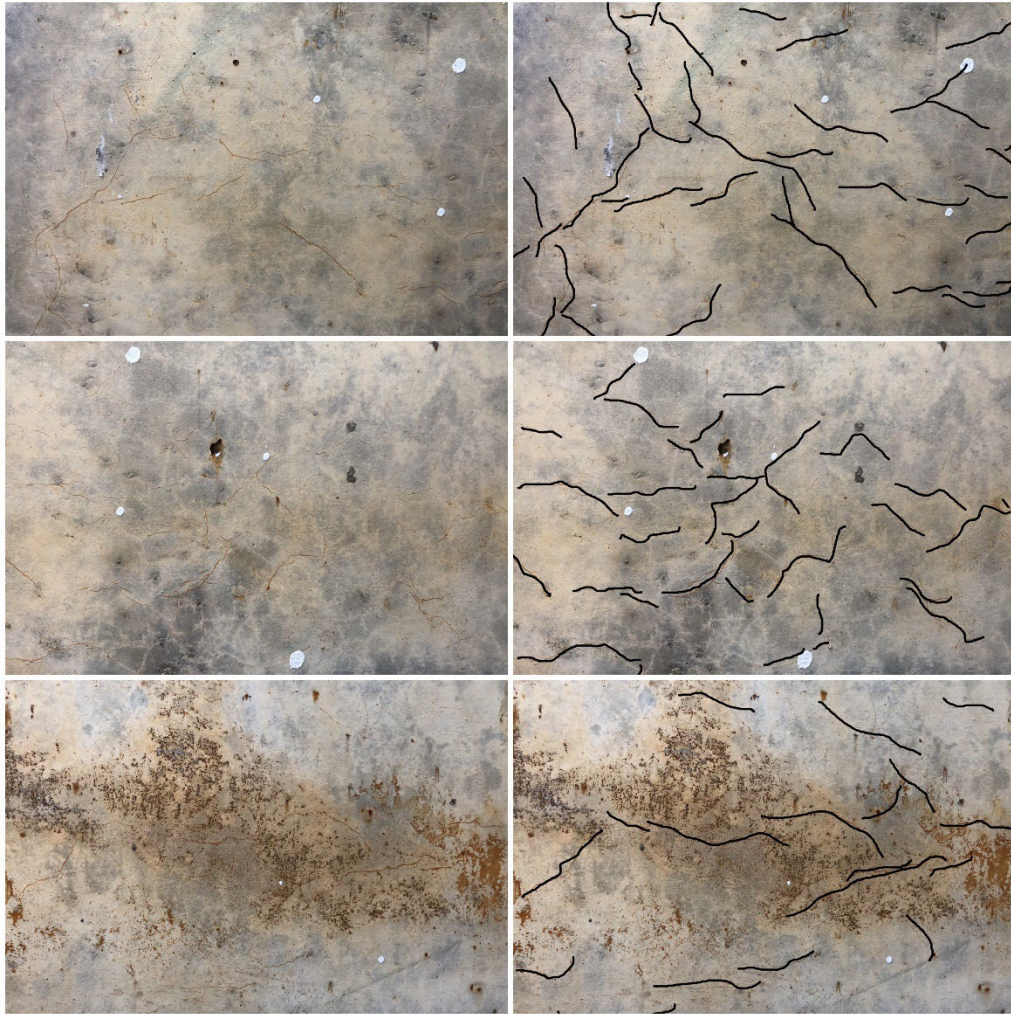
ASR cracks on the surface of reactive prestressed beams.
